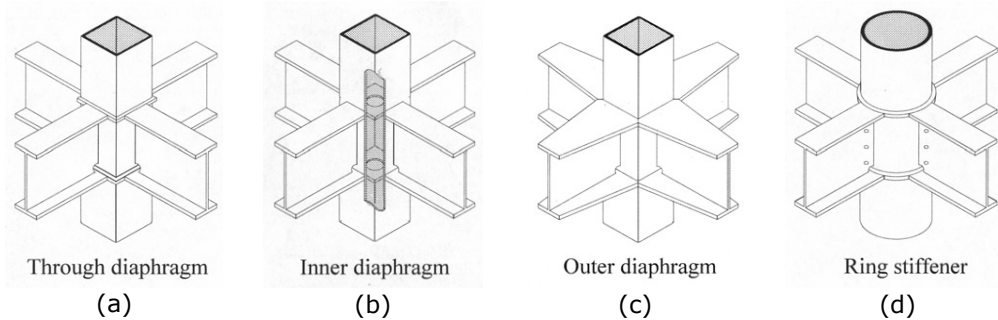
Concrete-filled steel tube column system in Japan: connections with (a) through diaphragm, (b) inner diaphragm, (c) outer diaphragm, and (d) ring stiffener [58]
